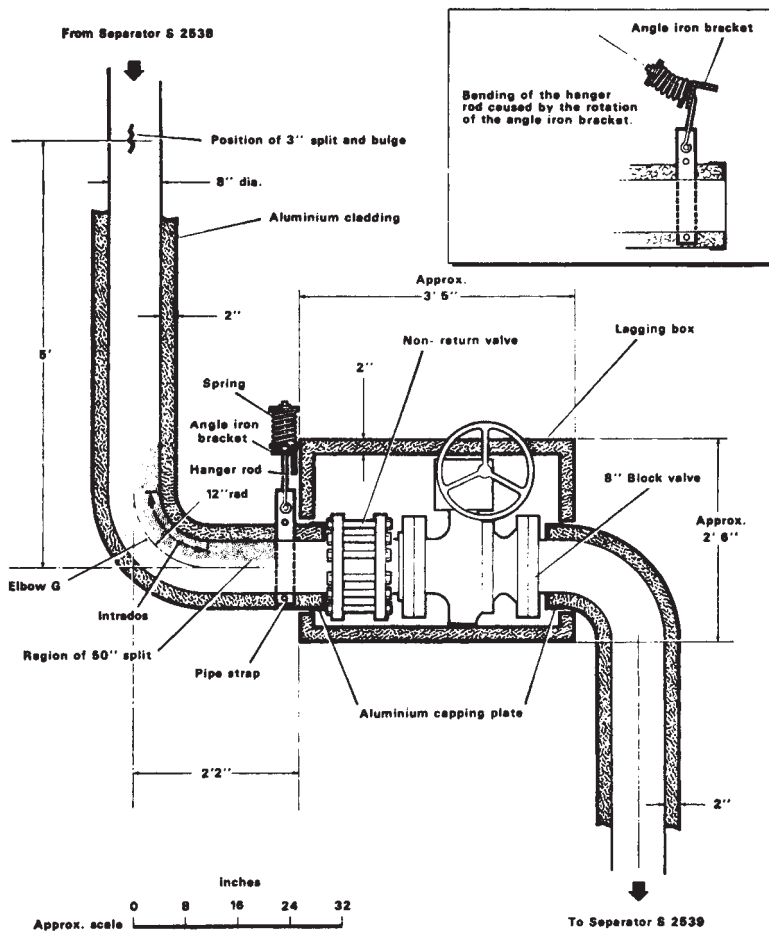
Elevation view of 8 in. line at Flixborough, showing typical lagging box around valve (R.J. Parker, 1975) (Courtesy of HM Stationery Office)
